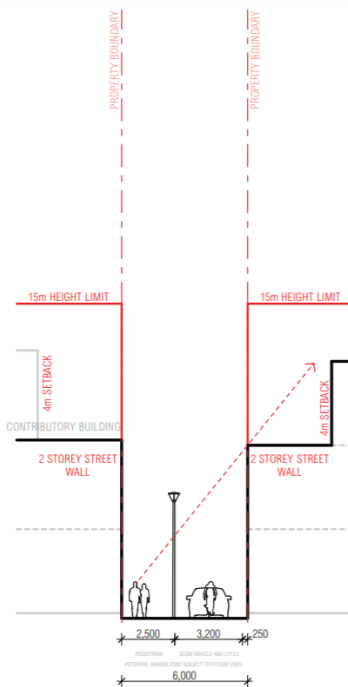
Indicative street section – Canal Street, North Alexandria
